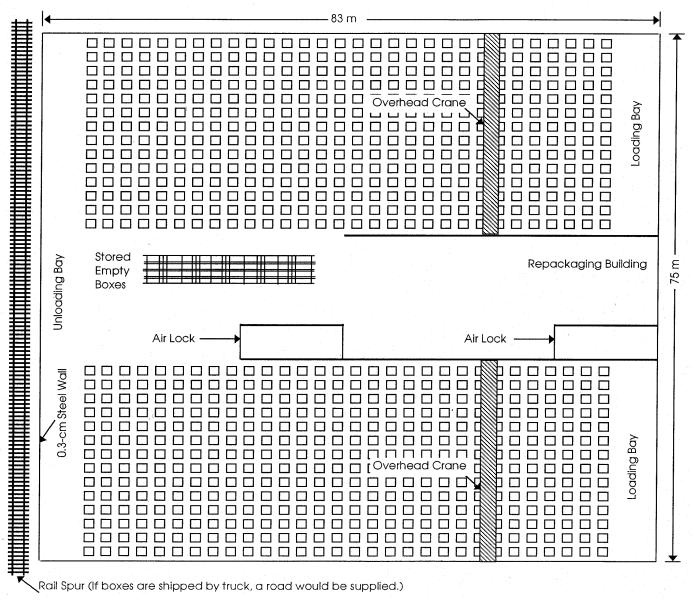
Plan View of the Receiving Warehouse and Repackaging Building — Uranium Metal, 100% Case
